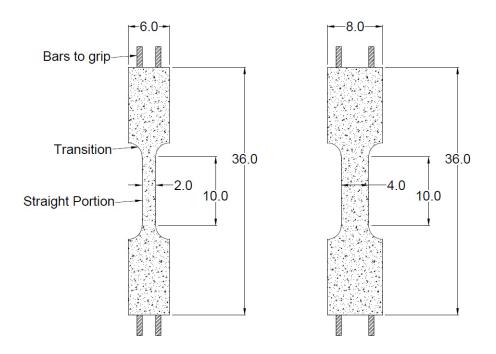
Specimen details (Dimensions in inches; 1 in. = 25.4 mm)
